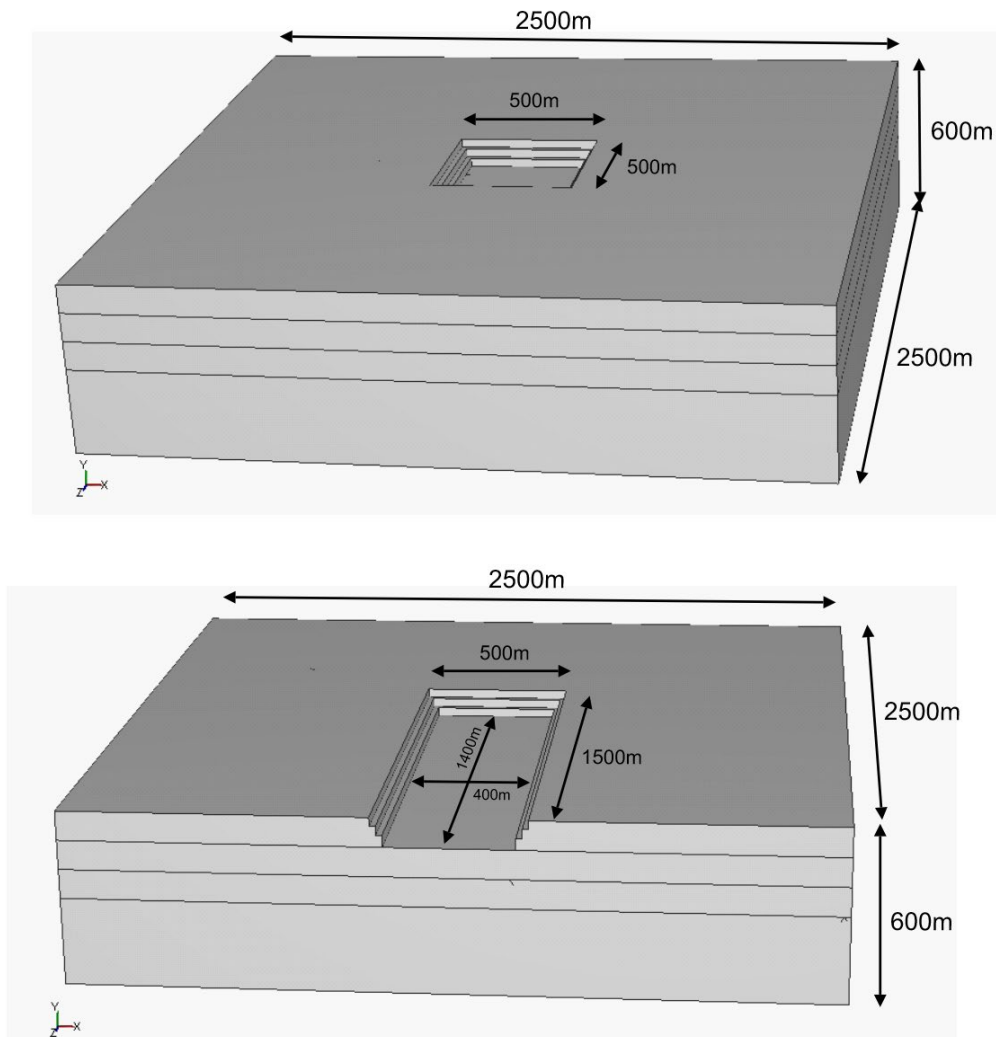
Three dimensional (3D) model configurations. Upper model - enclosed vertical excavation. Lower model – open-sided lateral excavation.
